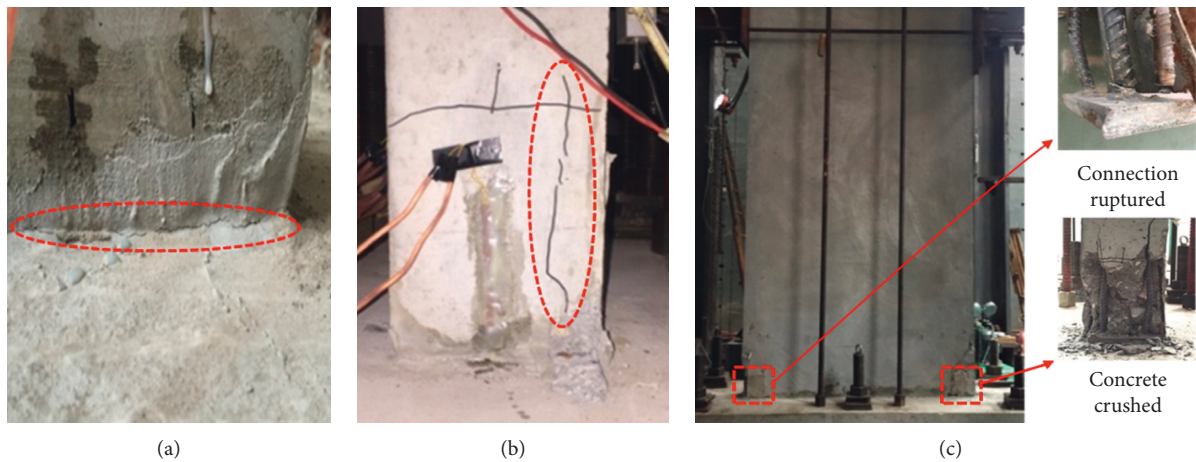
Observed damages of the specimen during the test: (a) tension crack of the filled interface, (b) compressive crack of the concrete, and (c) the failure mode.
